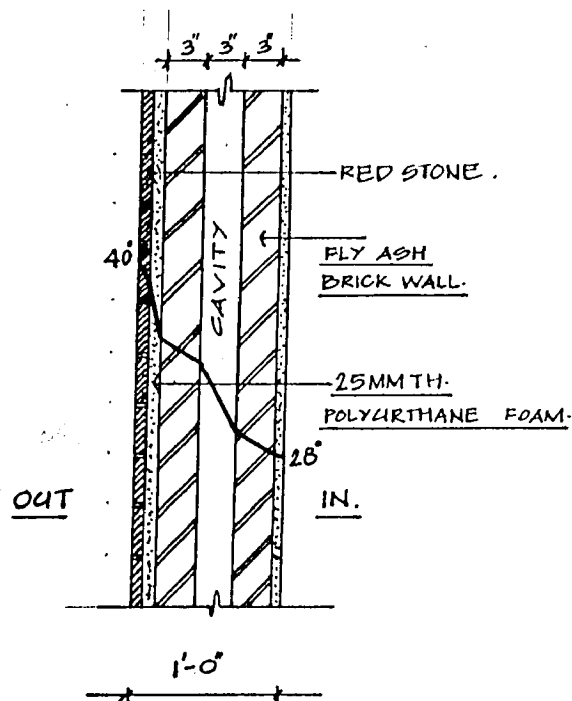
Using Insulation and Cavity Wall Construction Shows the Reduction in Heat Transfer
